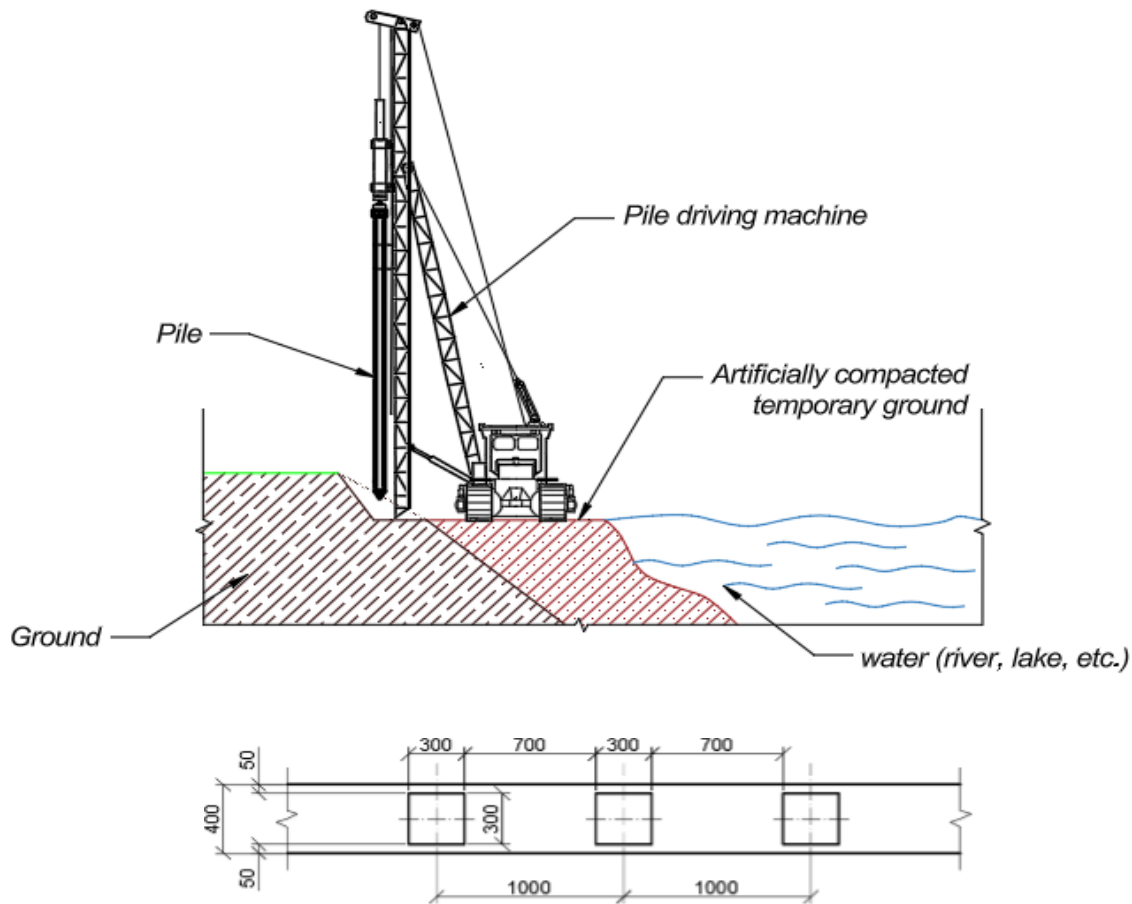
Working process of a pile driving machine and location of pile foundations for a retaining wall (author's material)
